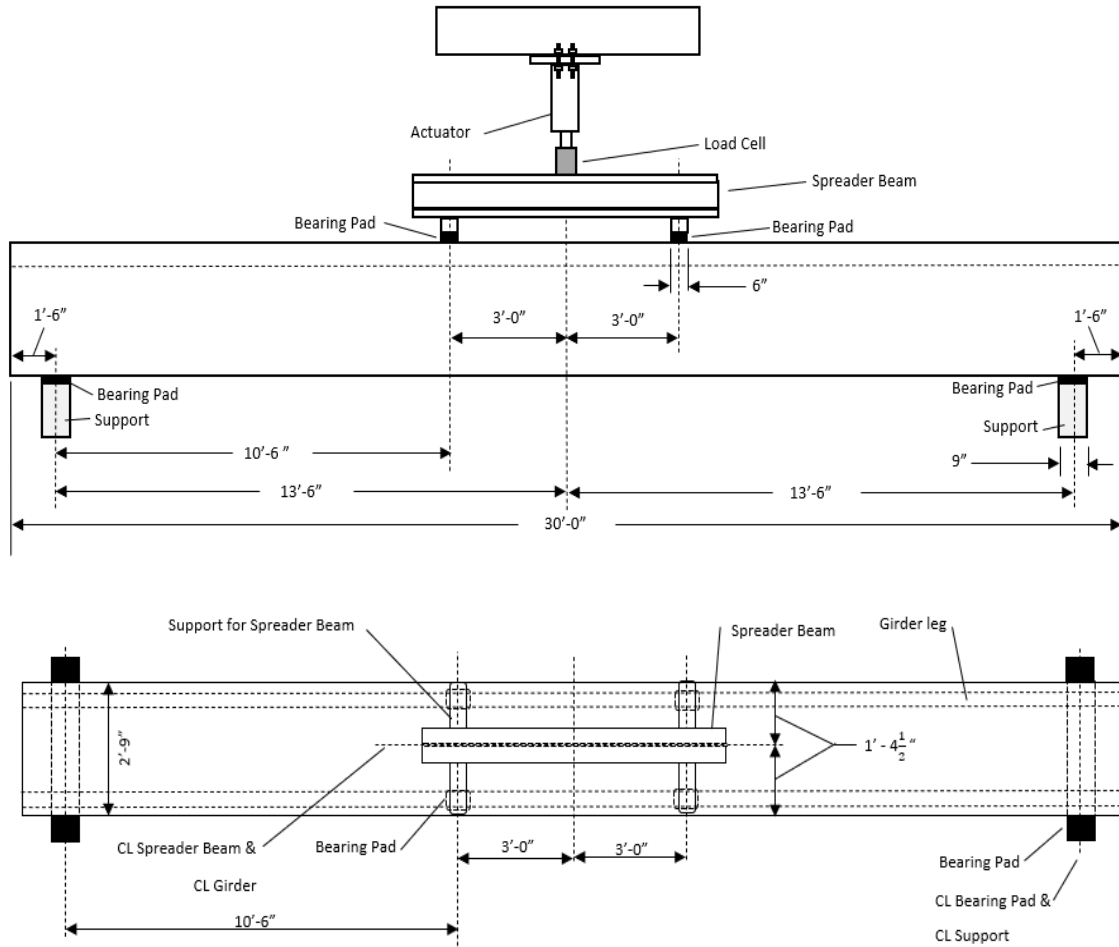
Elevation (top) and plan view (bottom) of girders test setup
